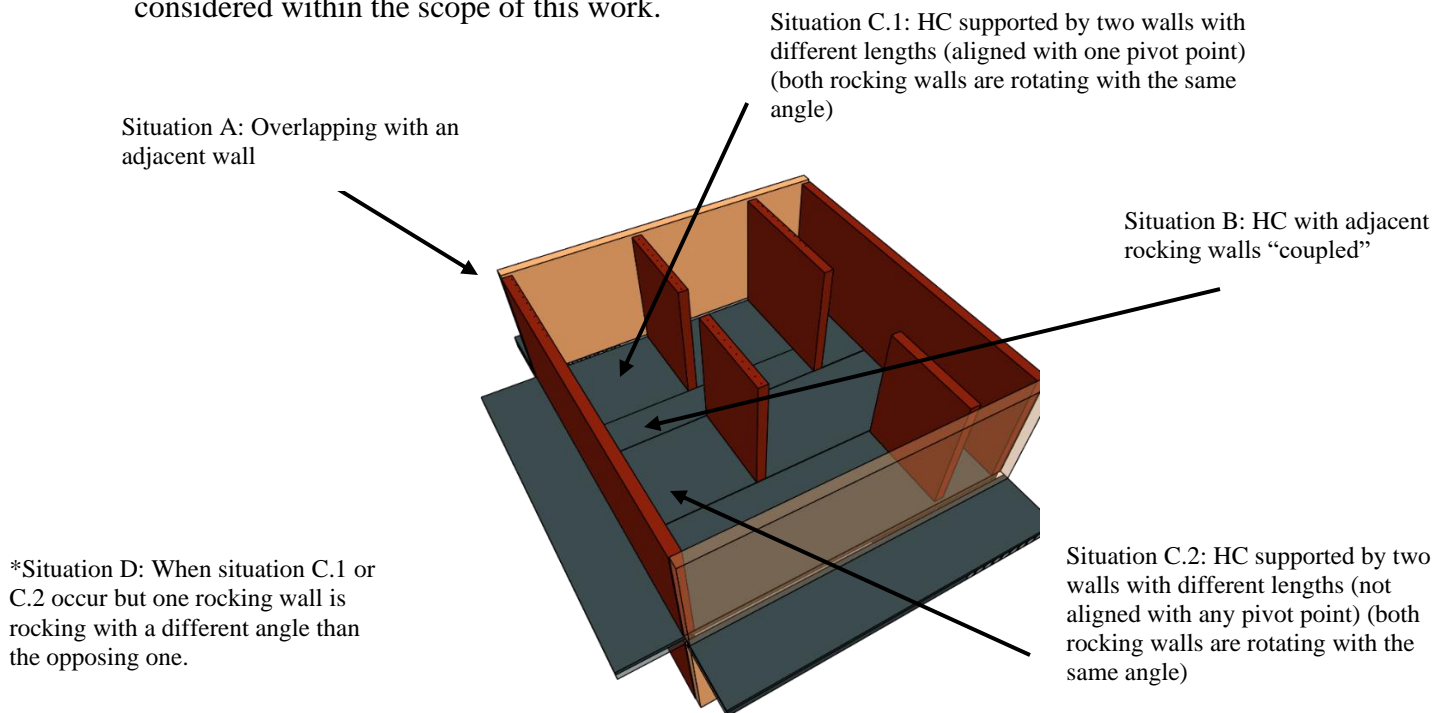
Floor plan with potential situations in a masonry building with rocking walls.
